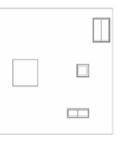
House in A Plum Grove Elevation 4 D 1.244 (Archi) and 1.200 (Benoit)
